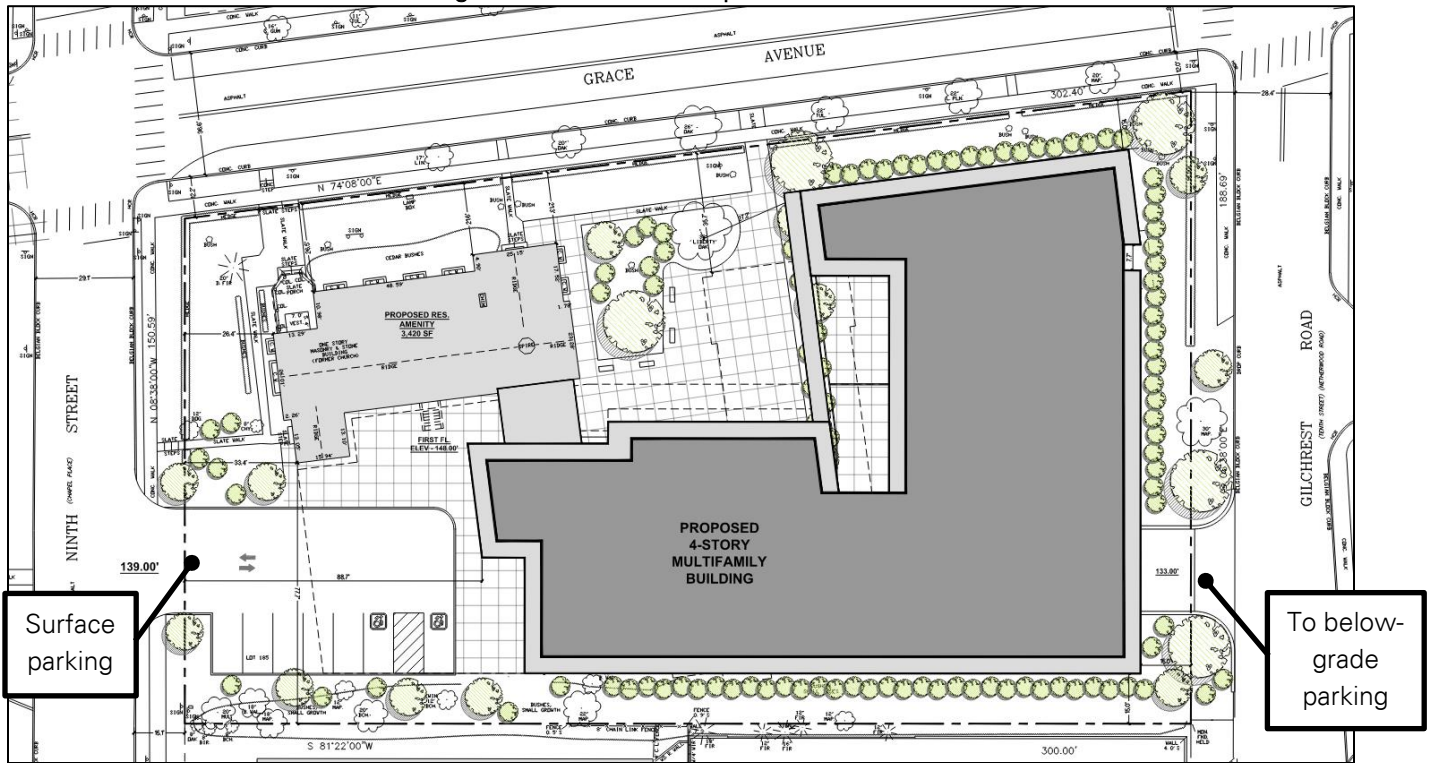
depicts an excerpt of the proposed site plan, prepared by Mojo-Stumer & Associates, P.C. and last revised January 16, 2026.
